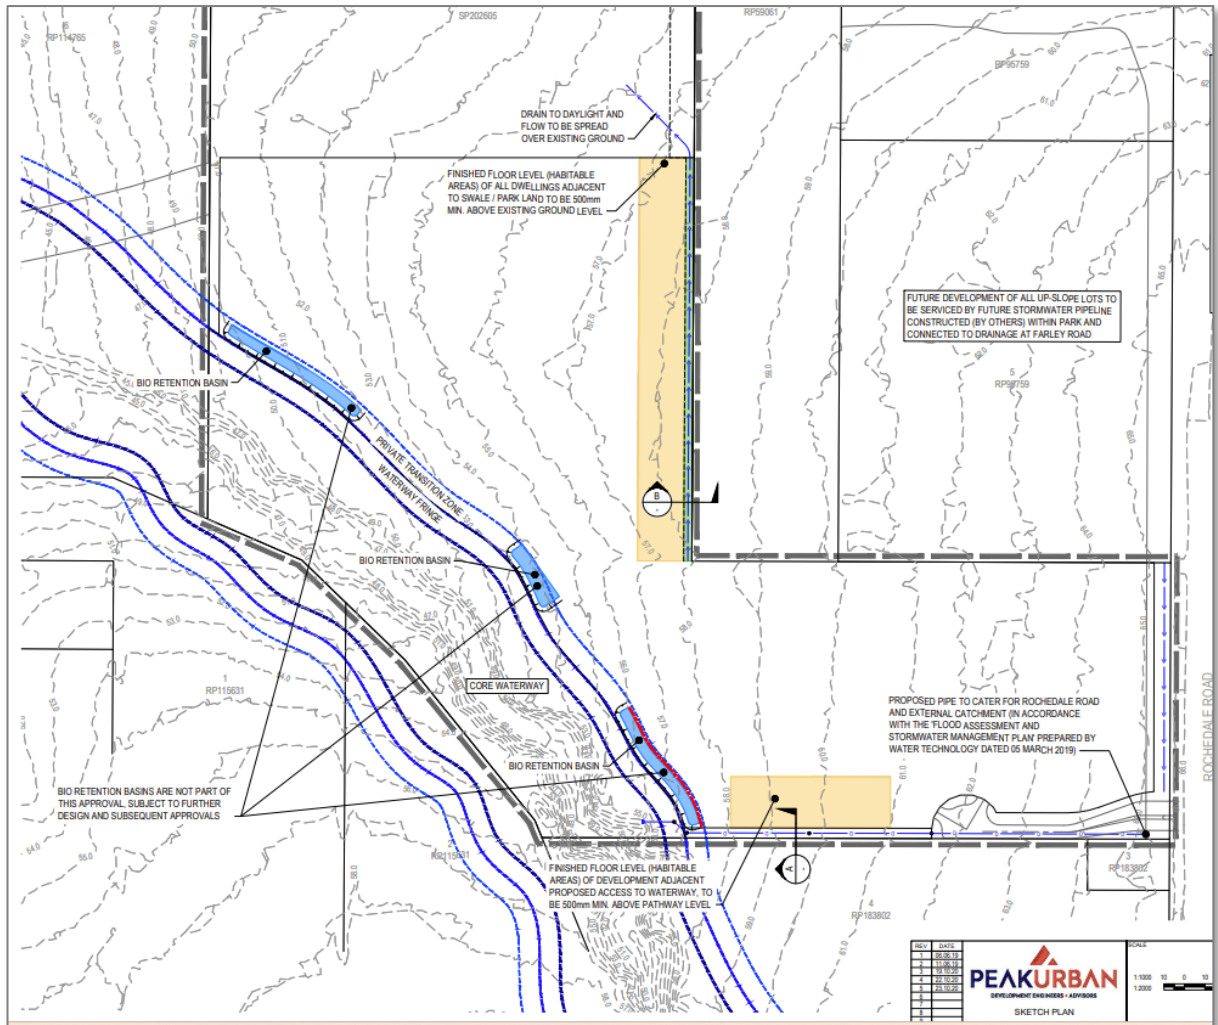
Approved Stormwater Management Plan at 323 Rochedale Road (A006310847) showing extent of waterway to inform development extent
